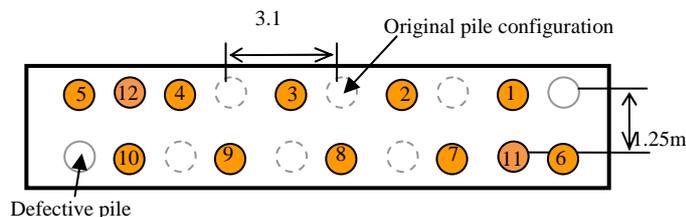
Revised Pier S2 Pile Configuration with 12 Piles
